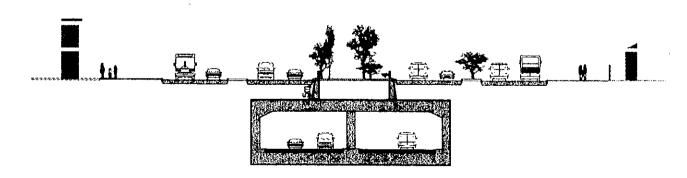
Typical Section of Under Pass Structure on Existing Road
